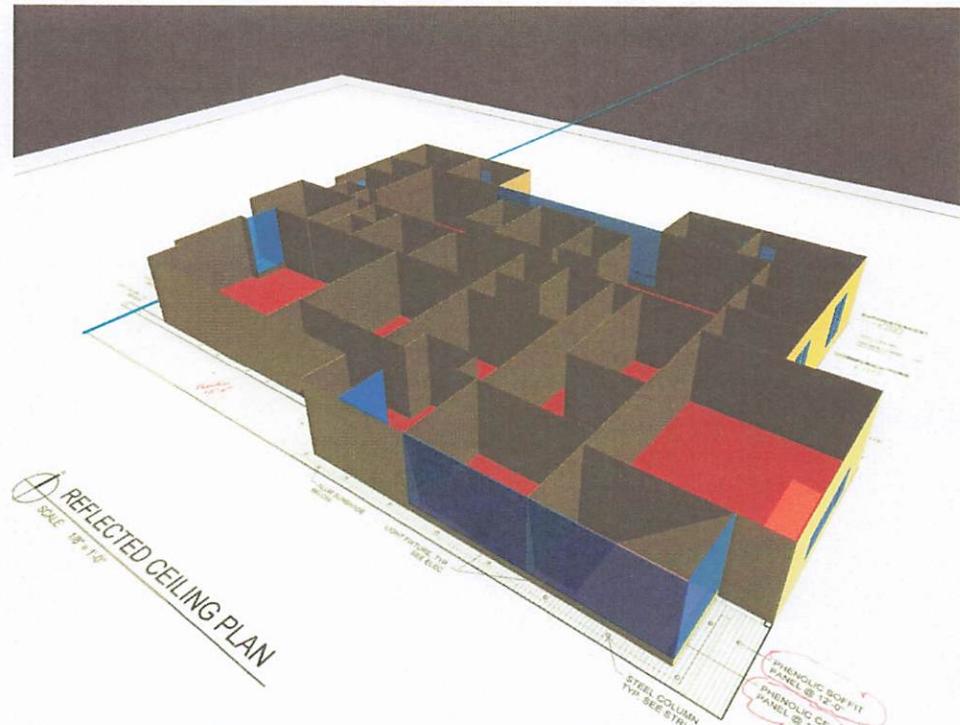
Trace 3D Building Model – Interior, View Looking NW
